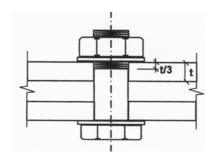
Threaded portion of the shank in the bearing length for fit bolts
